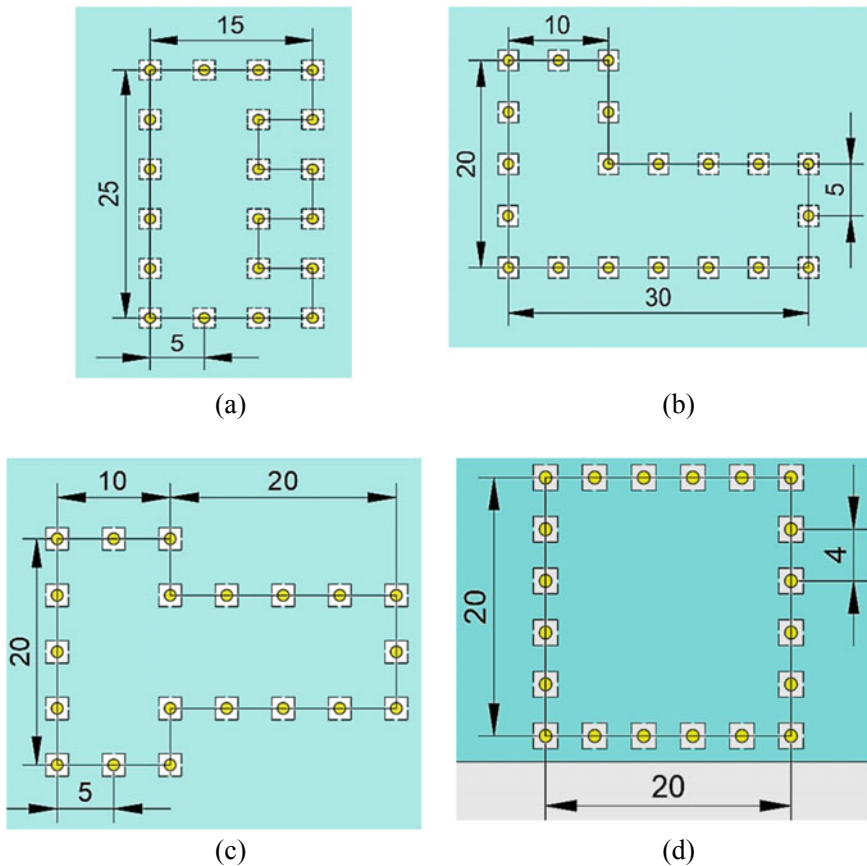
a ‘E’ shaped, b ‘L’ shaped, c ‘T’ shaped and d square shaped building
